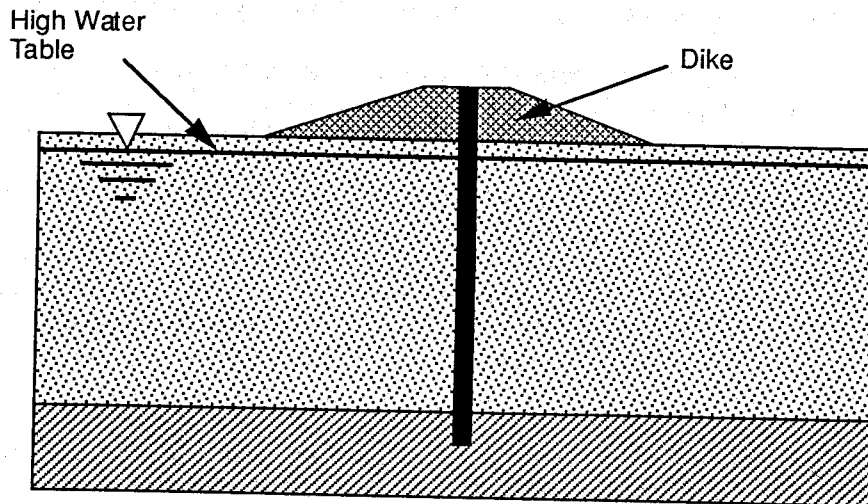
Construction of Dike to Raise Ground Surface for Construction of Slurry Trench.
